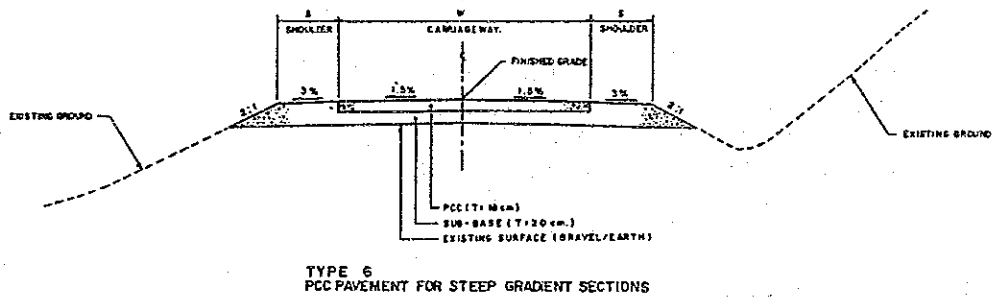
TYPICAL ROAD SECTIONS (6)
